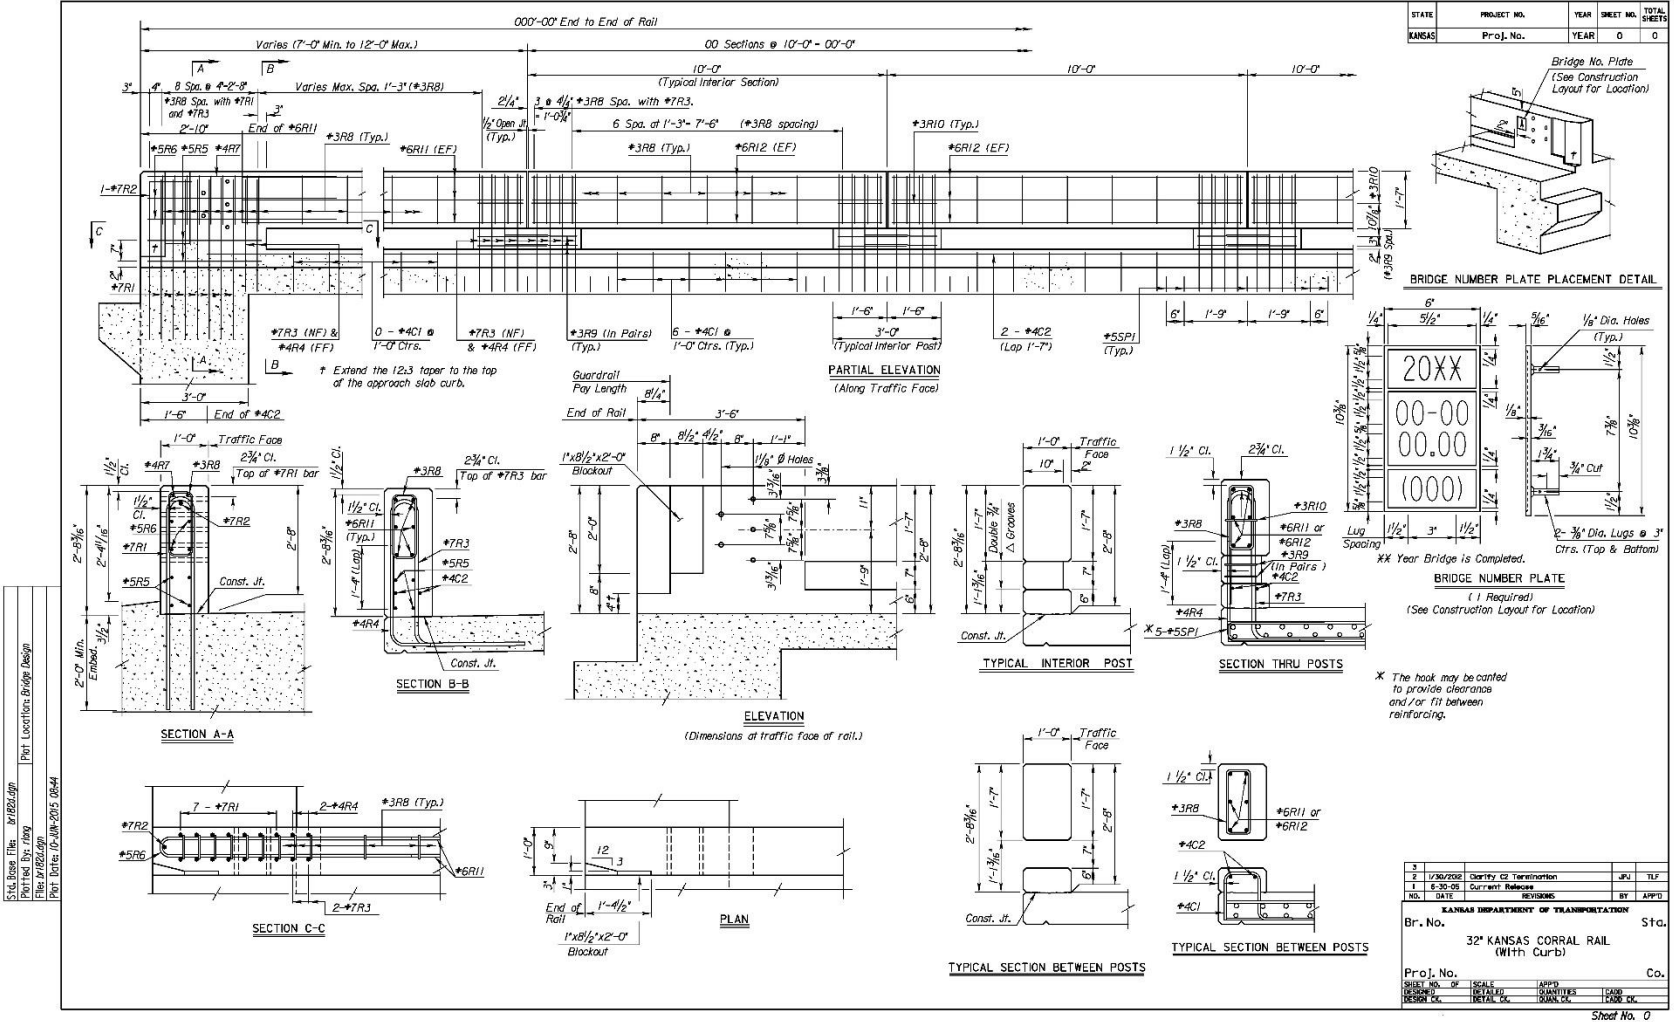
KDOT Open Concrete Corral Rail Details [8]
